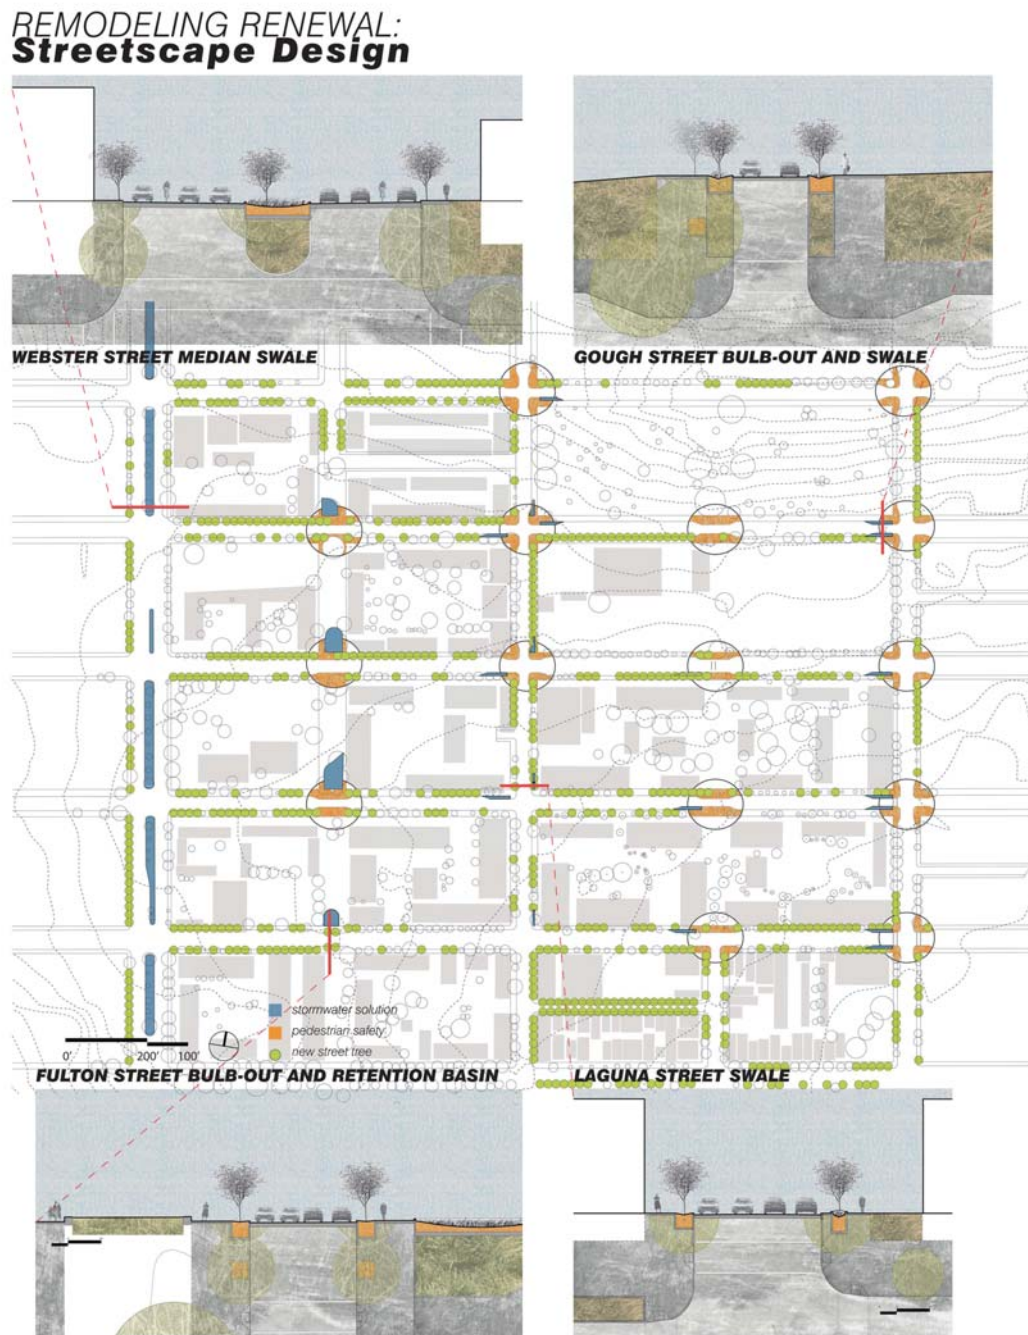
Street Plan for all the eight blocks in Western Addition (Webster)
